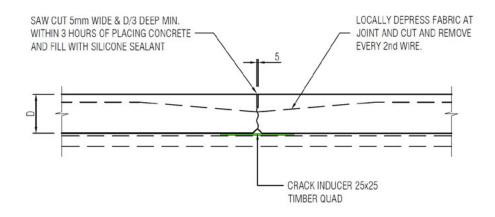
A Saw Cut Joint (SCJ) typical detail
